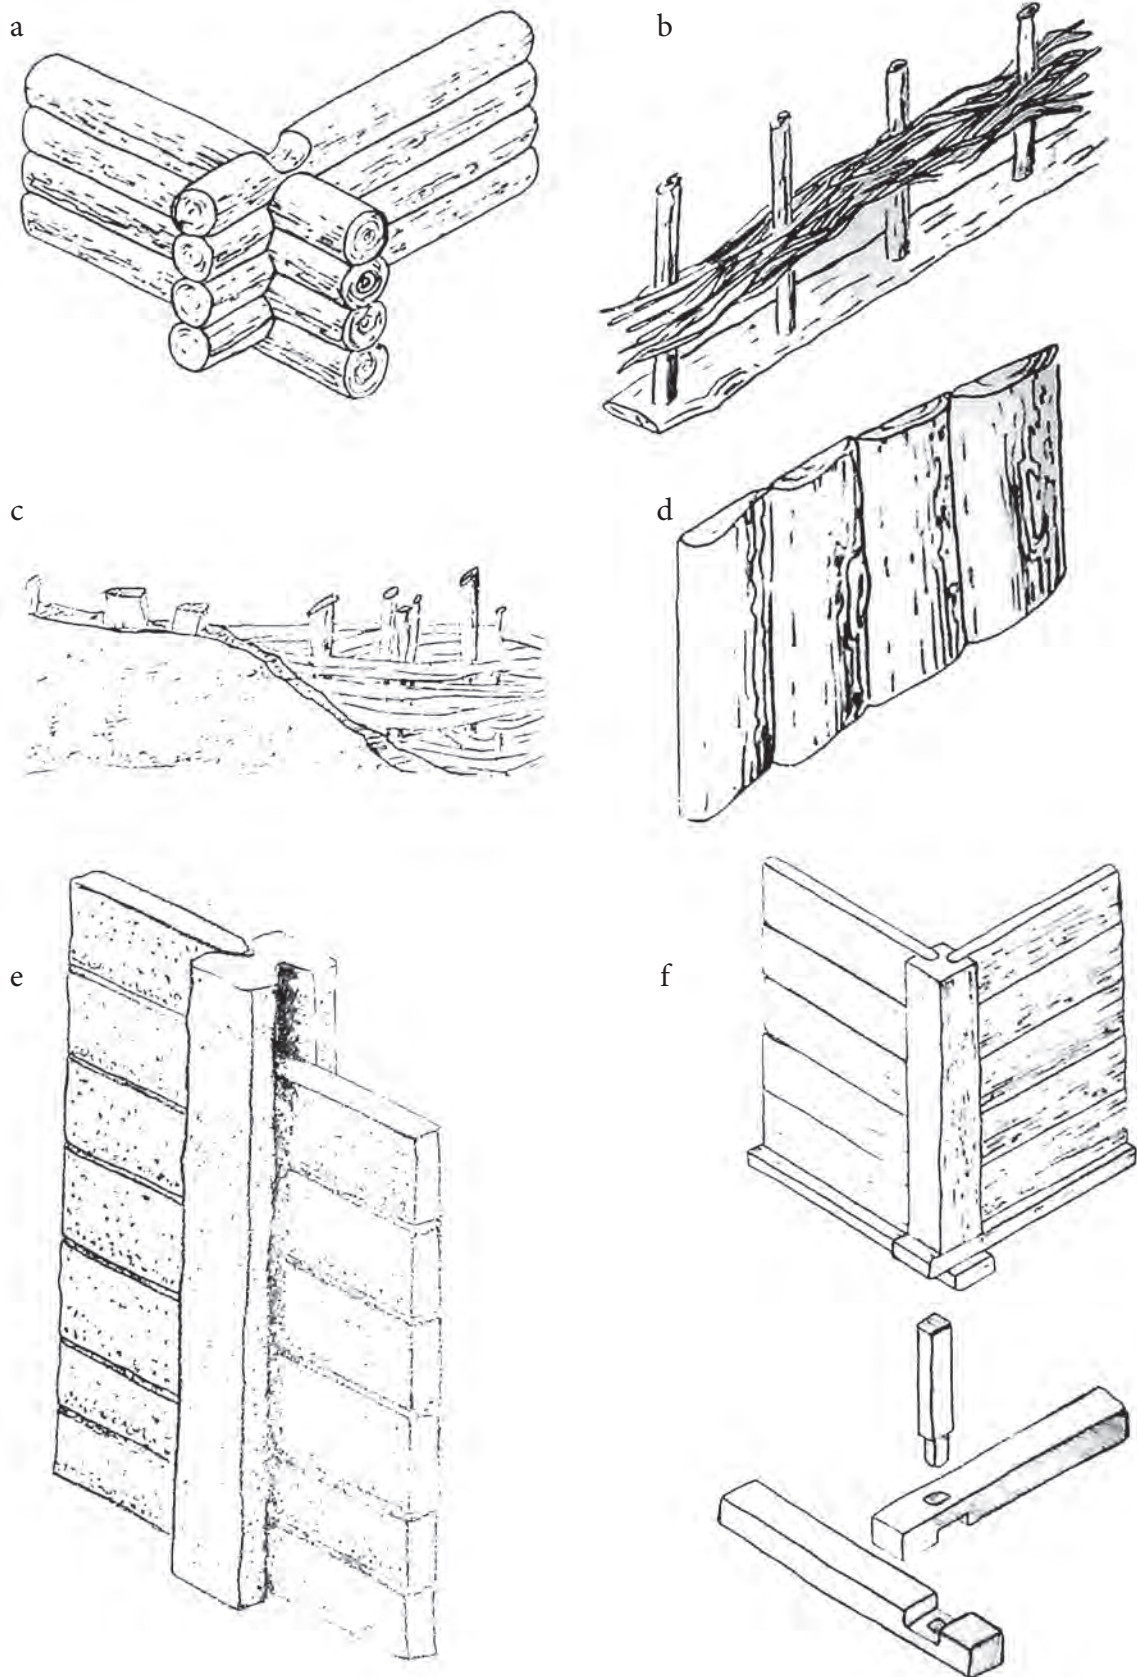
Different kinds of lake-dwelling walls. a) Block-construction; b) Wattle; c) Wattle and daub; d) Split roundwood; e) Plank-pillar; f) Plank-pillar with mortise and tenon joints (from Menotti 2012, 135, Fig. 4.4).
